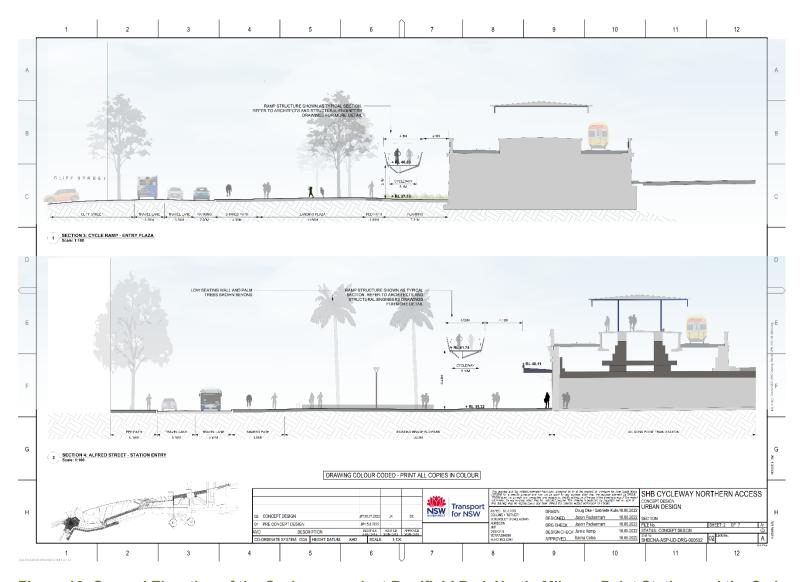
General Elevation of the Cycleway against Bradfield Park North, Milsons Point Station and the Sydney Harbour Bridge parapet (Source: Urban Design drawings, Aspect, 2022)
